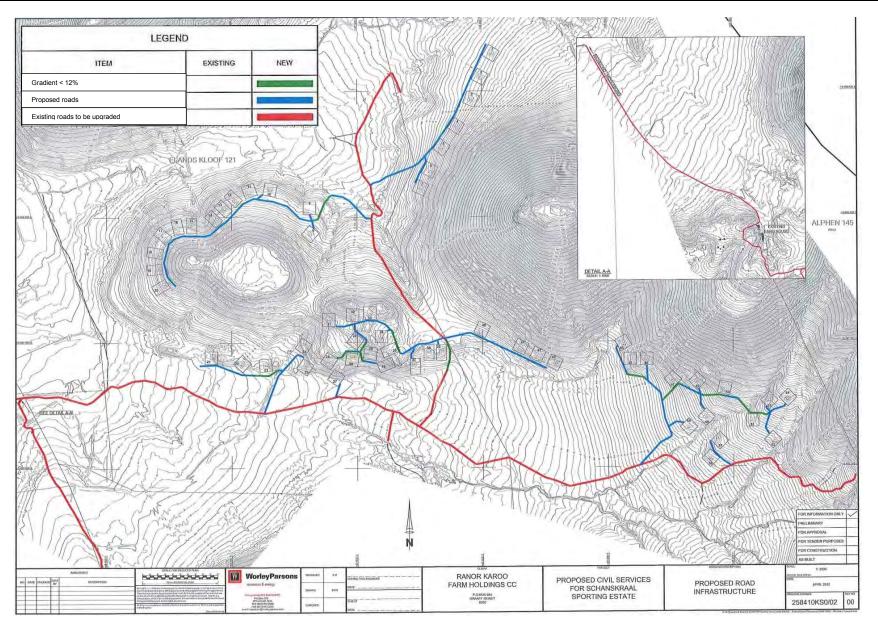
Proposed road infrastructure (for Layout Alternative 1)
